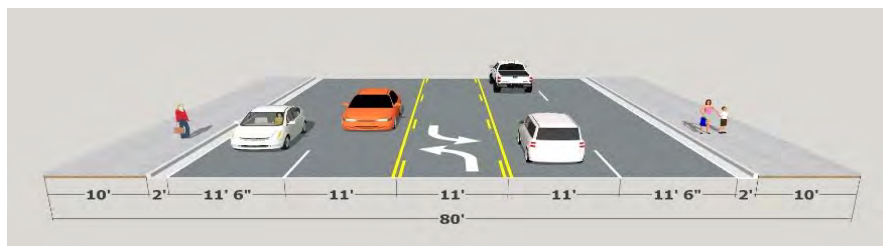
5/4 Lane Alternative A - Buffered Sidewalk (12th Street to 11th Street)
